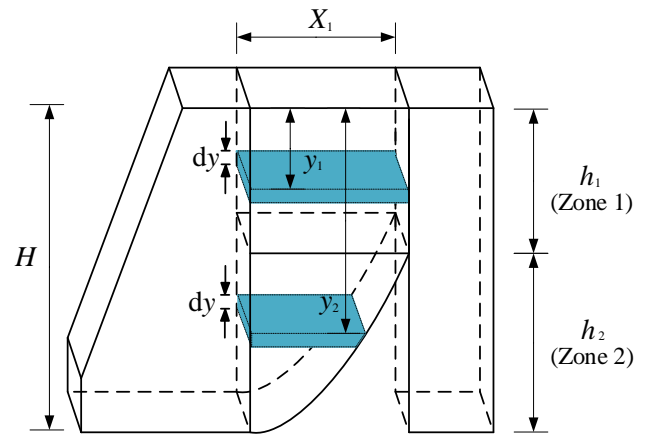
A schematic diagram of the limited soil slip failure surface of the retaining wall.
